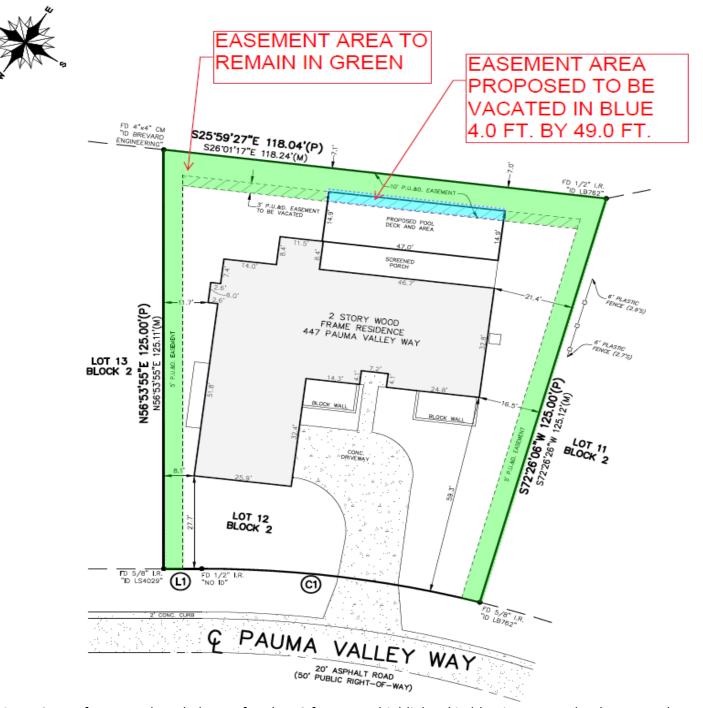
Copy of proposed pool plan 15 feet by 49 feet. Area highlighted in blue is proposed to be vacated to allow for construction of a pool. Area in green shows easement that will remain.
